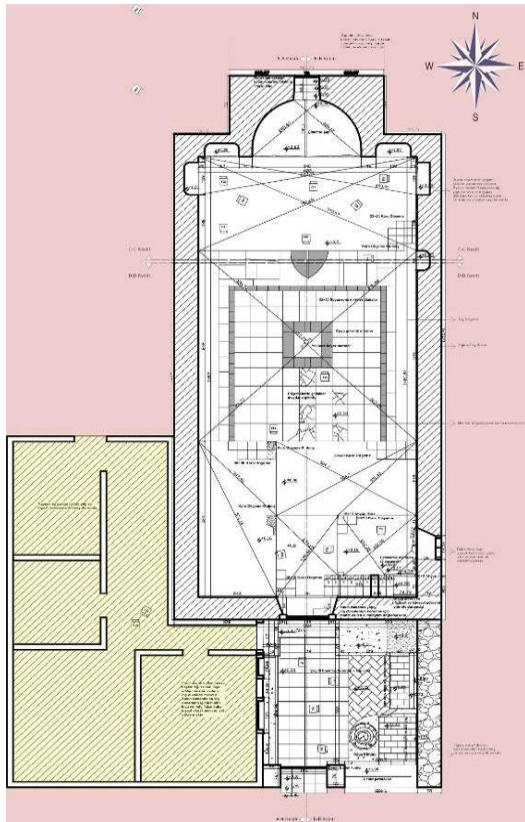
Ground Plan, Source: Arch. SEDES, F.
